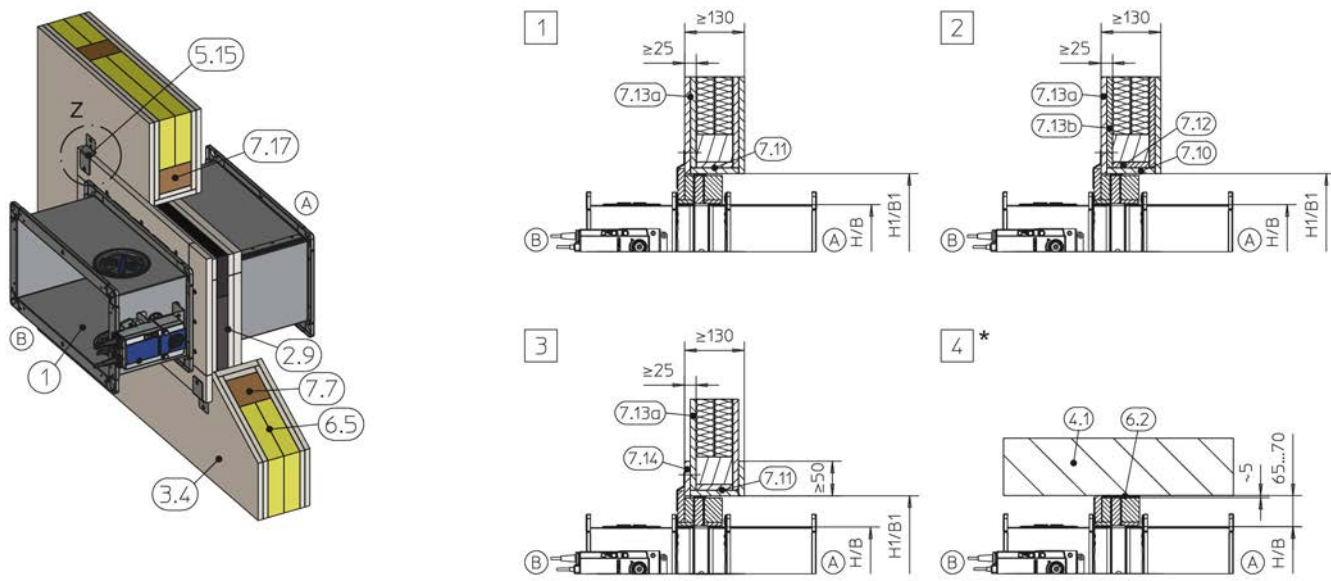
Mortar-based installation into a lightweight partition wall with timber studs, "flange to flange", illustration shows side by side installation (applies also to installation of dampers on top of each other and for half-timbered construction)
